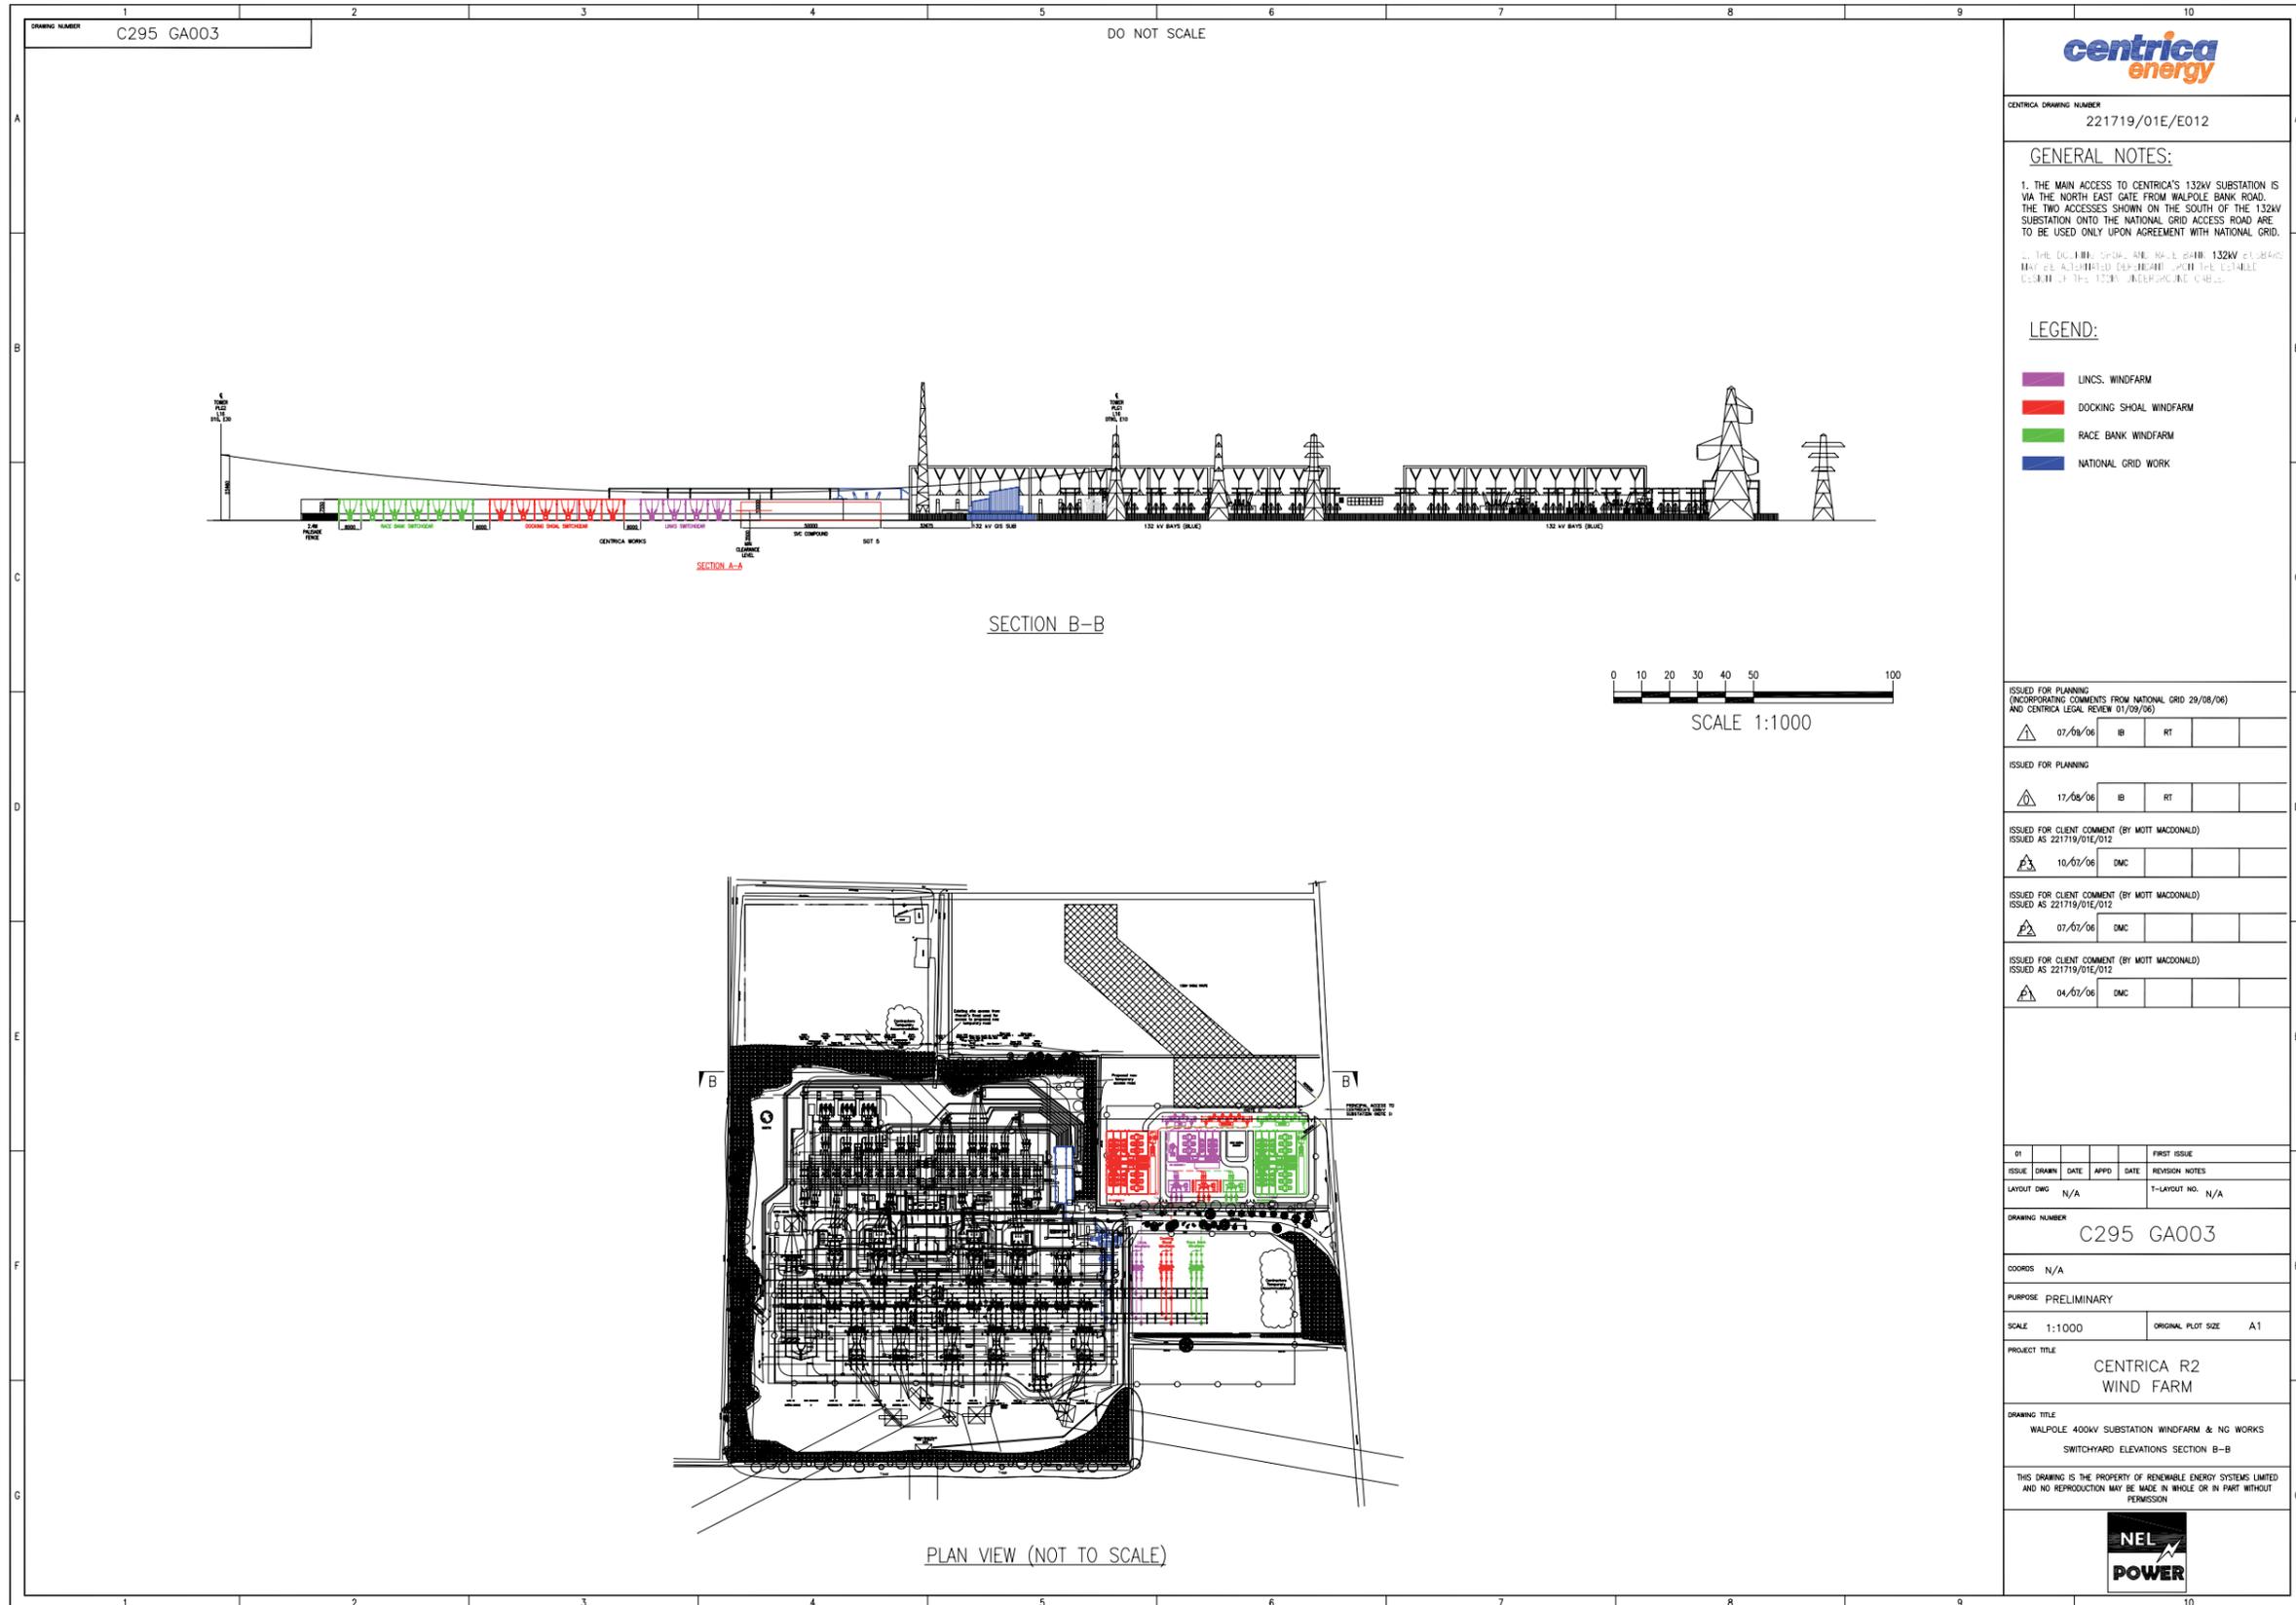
| Layout of the substations for Lincs, Docking Shoal and Race Bank in relation to the existing substation at Walpole Marsh - Section B-B
